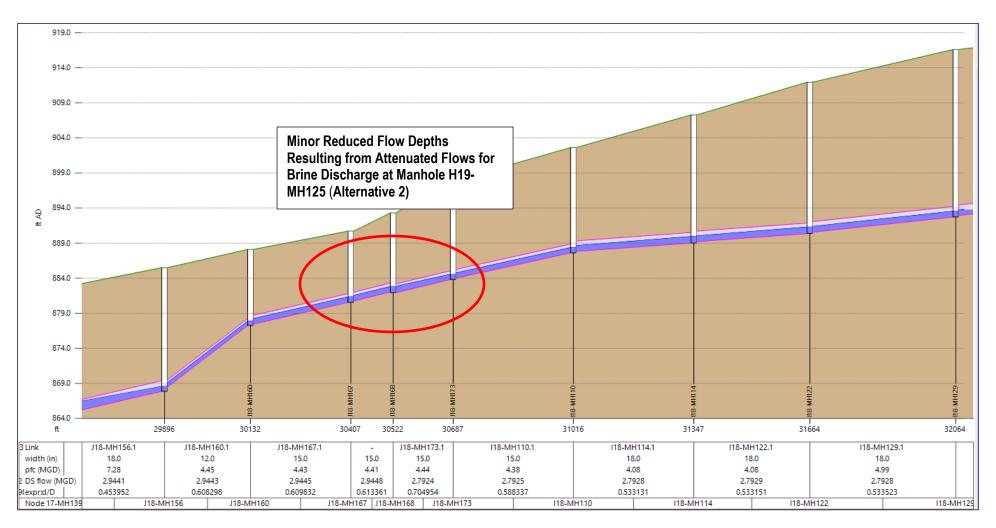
Future PWWF / 24-hr Brine / Design Storm / Manhole Connect Alternative 2 – Detail Profile Showing d/D for Pipe Segments Downstream of J18-MH173 Green line = Ground level / Blue line = Hydraulic profile (with water depth) / Vertical lines = Manholes
